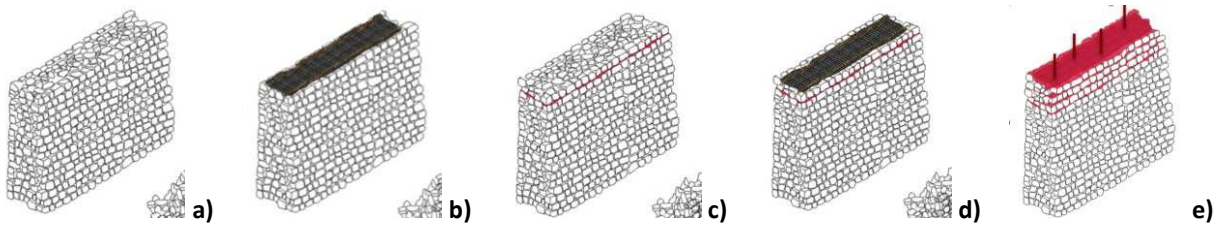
Construction methods of a reinforced masonry ring beam: a) removing the upper part of the existing wall; b) applying the first mortar layer reinforced with the GFRP grid; c) applying the stones; d) applying a second GFRP reinforced mortar layer; e) repeating the phases described in c) and d) until reaching the necessary height
